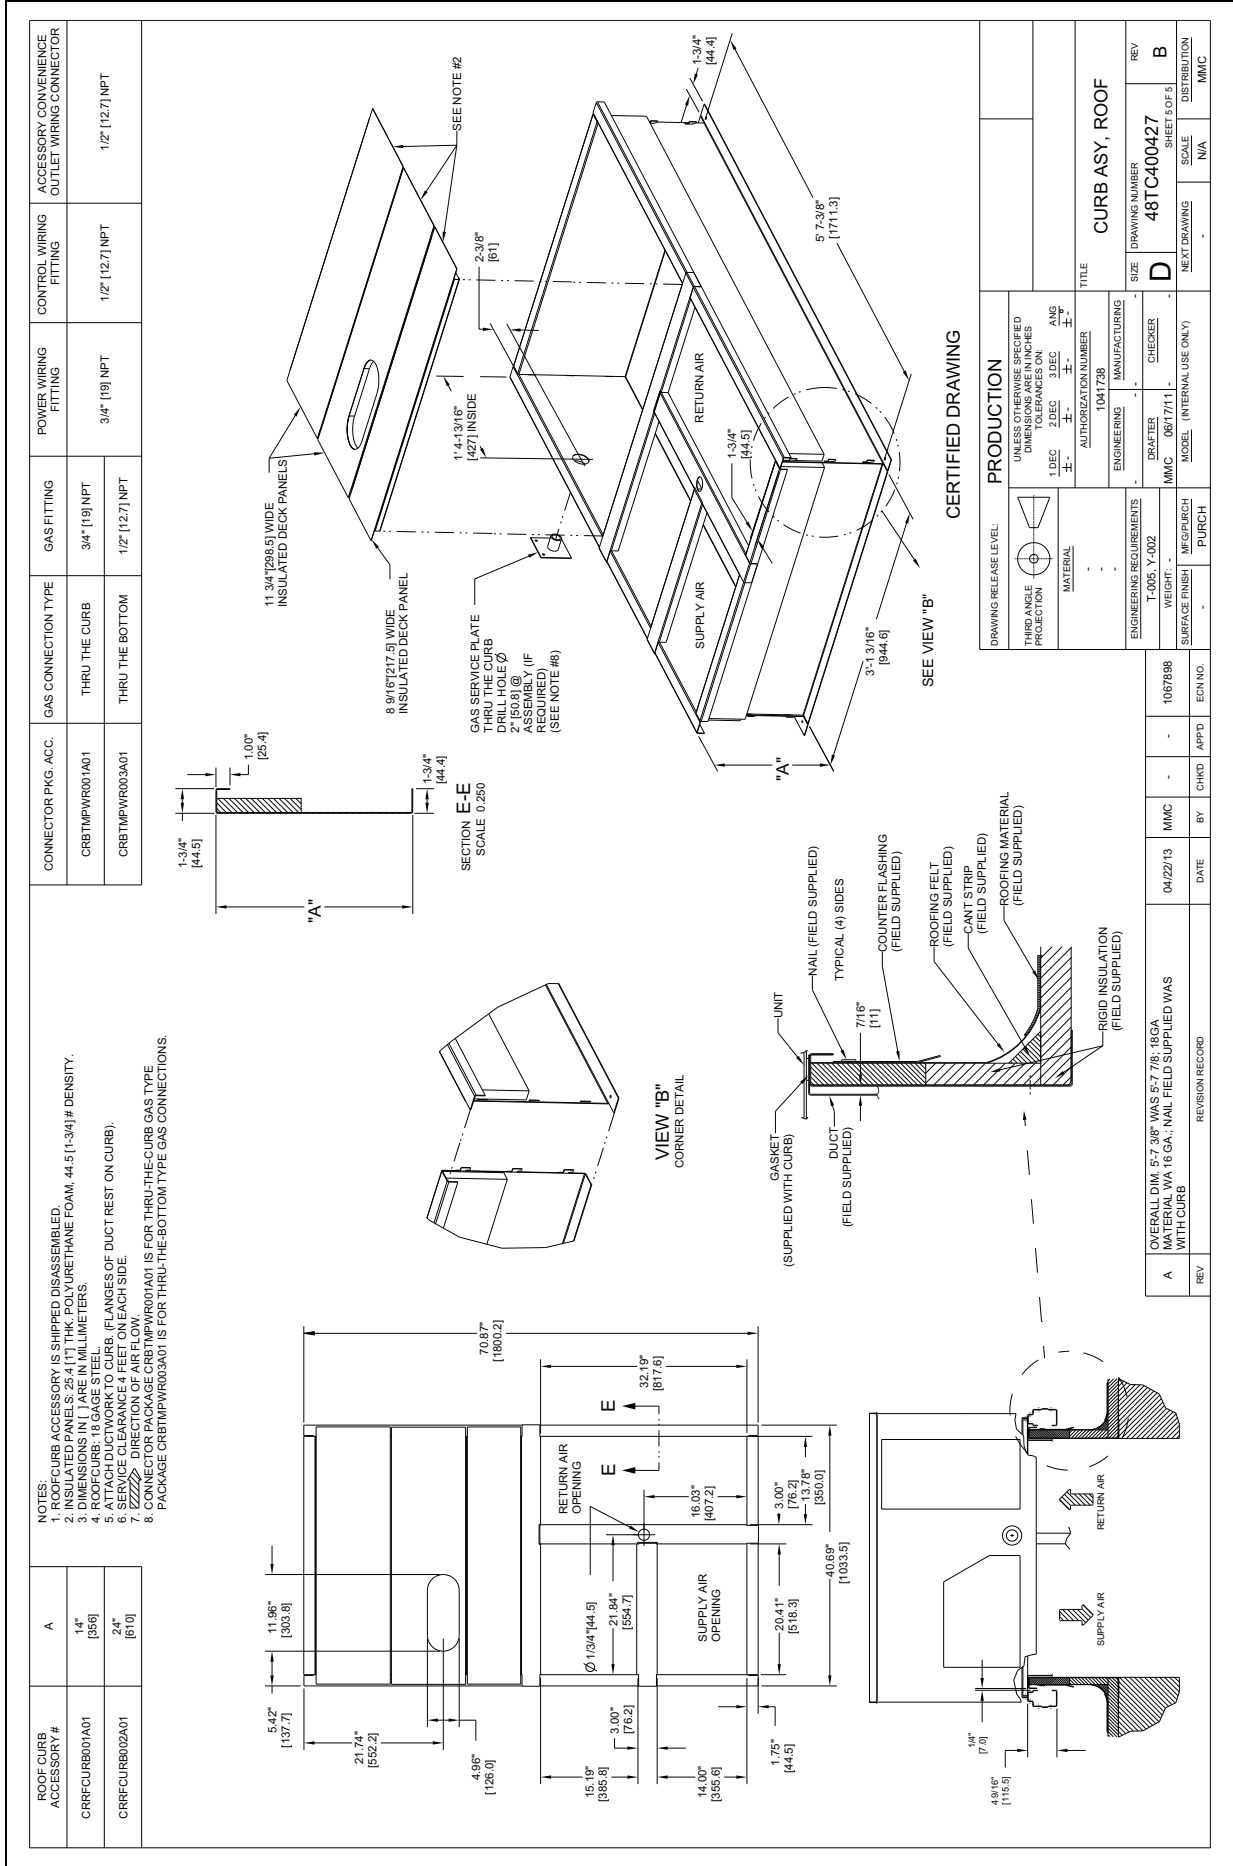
48GCG*04-06 Roof Curb Dimensions
